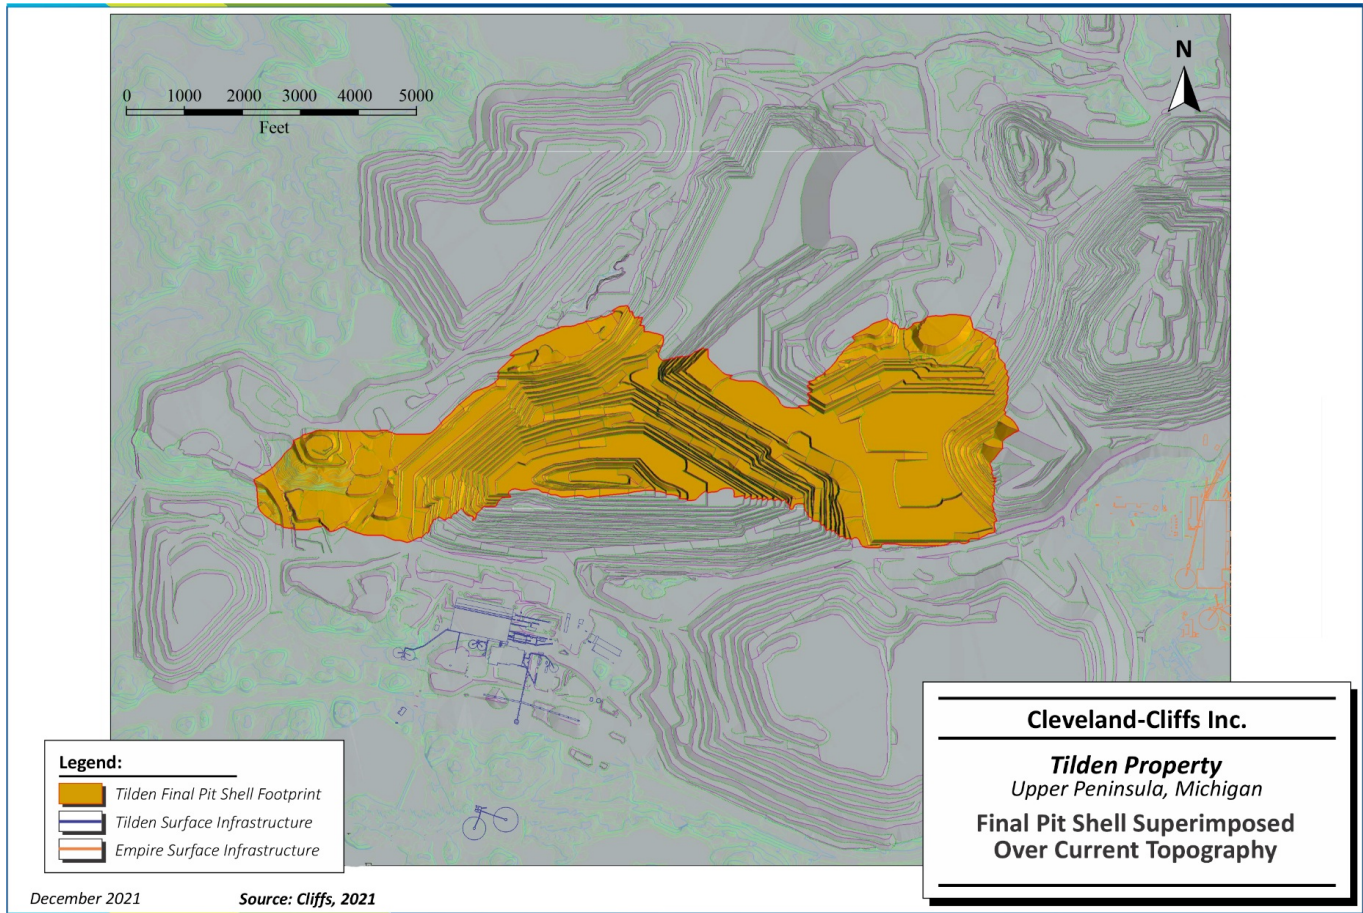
Final Pit Shell Superimposed Over Current Topography
